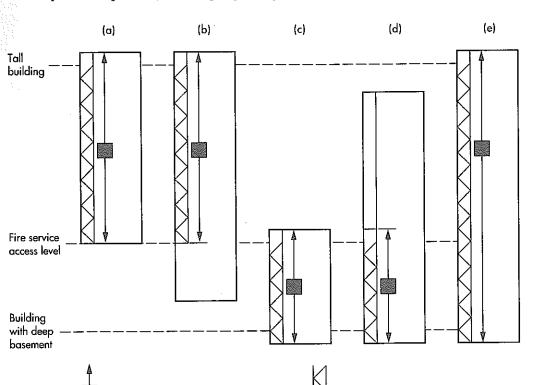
Extent of travel of firefighting lift; (a) buildings over 18 m high without basement, (b) buildings over 18 m high with basement less than 9 m deep, (c) buildings with basement only; (d) buildings less than 18 m high with deep basement, (e) buildings over 18 m high with deep basement
